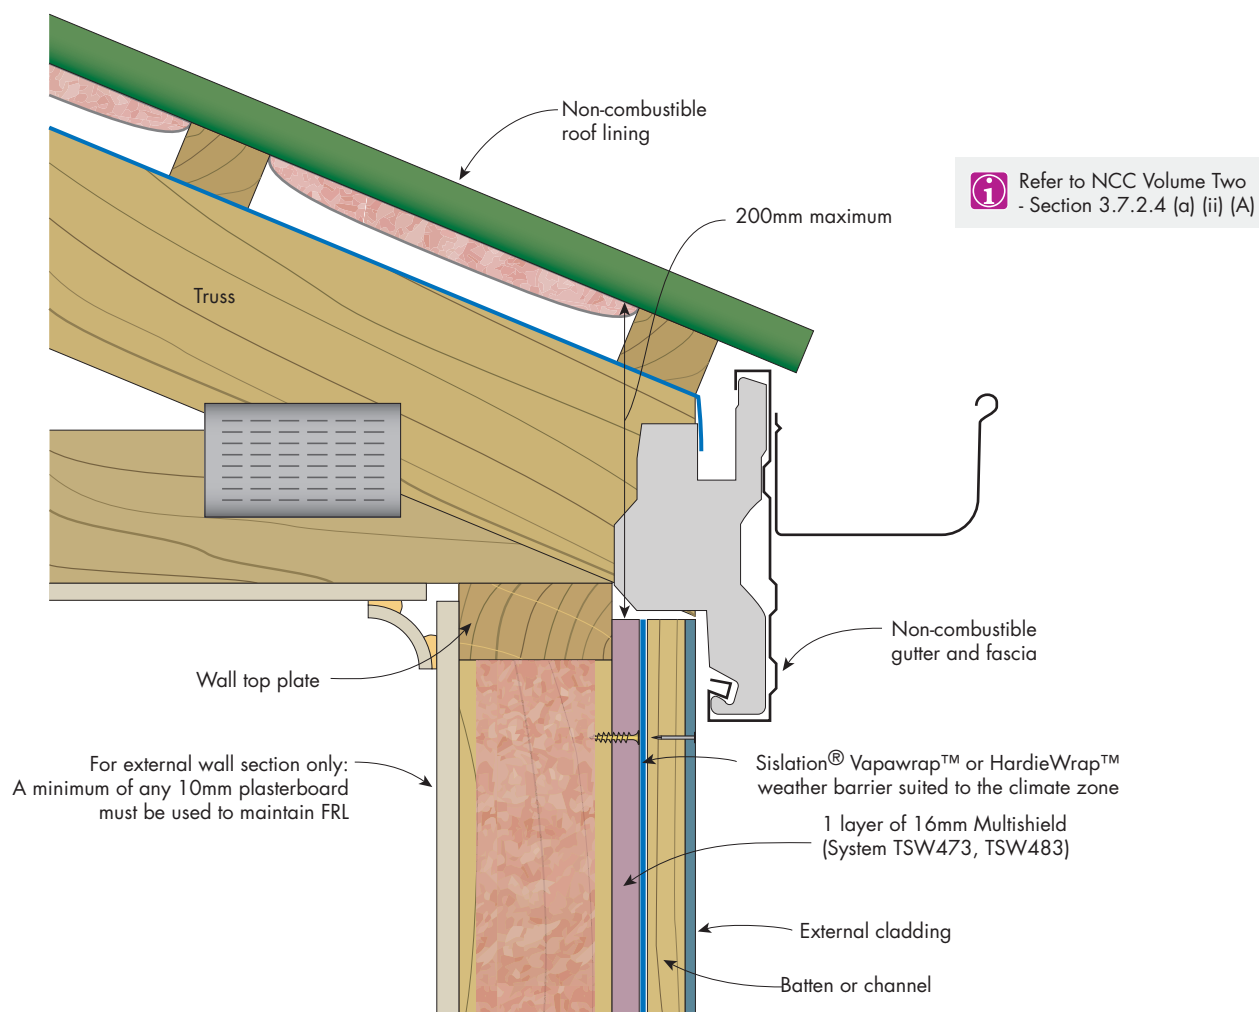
External Timber Wall to Non-combustible Roof Lining
